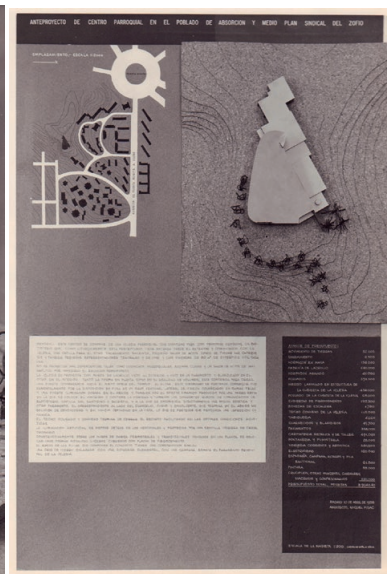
and 10b. Fisac. Draft for the parish centre in the absorption settlement Zofío, 1958. Floor plan and elevation.
